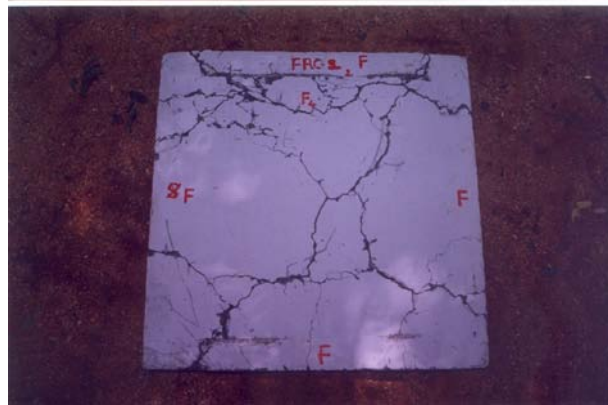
Failed specimen depicting crack pattern of FRC-2% fibre volume slab specimen
